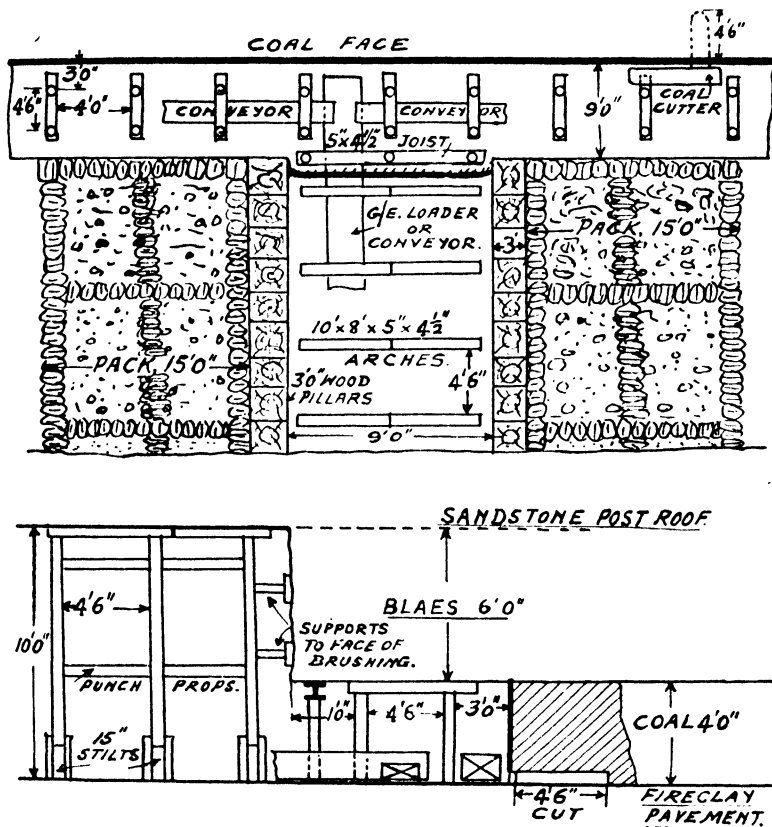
Plan and Section showing Method of supporting the Roof Strata at Roadheads.
